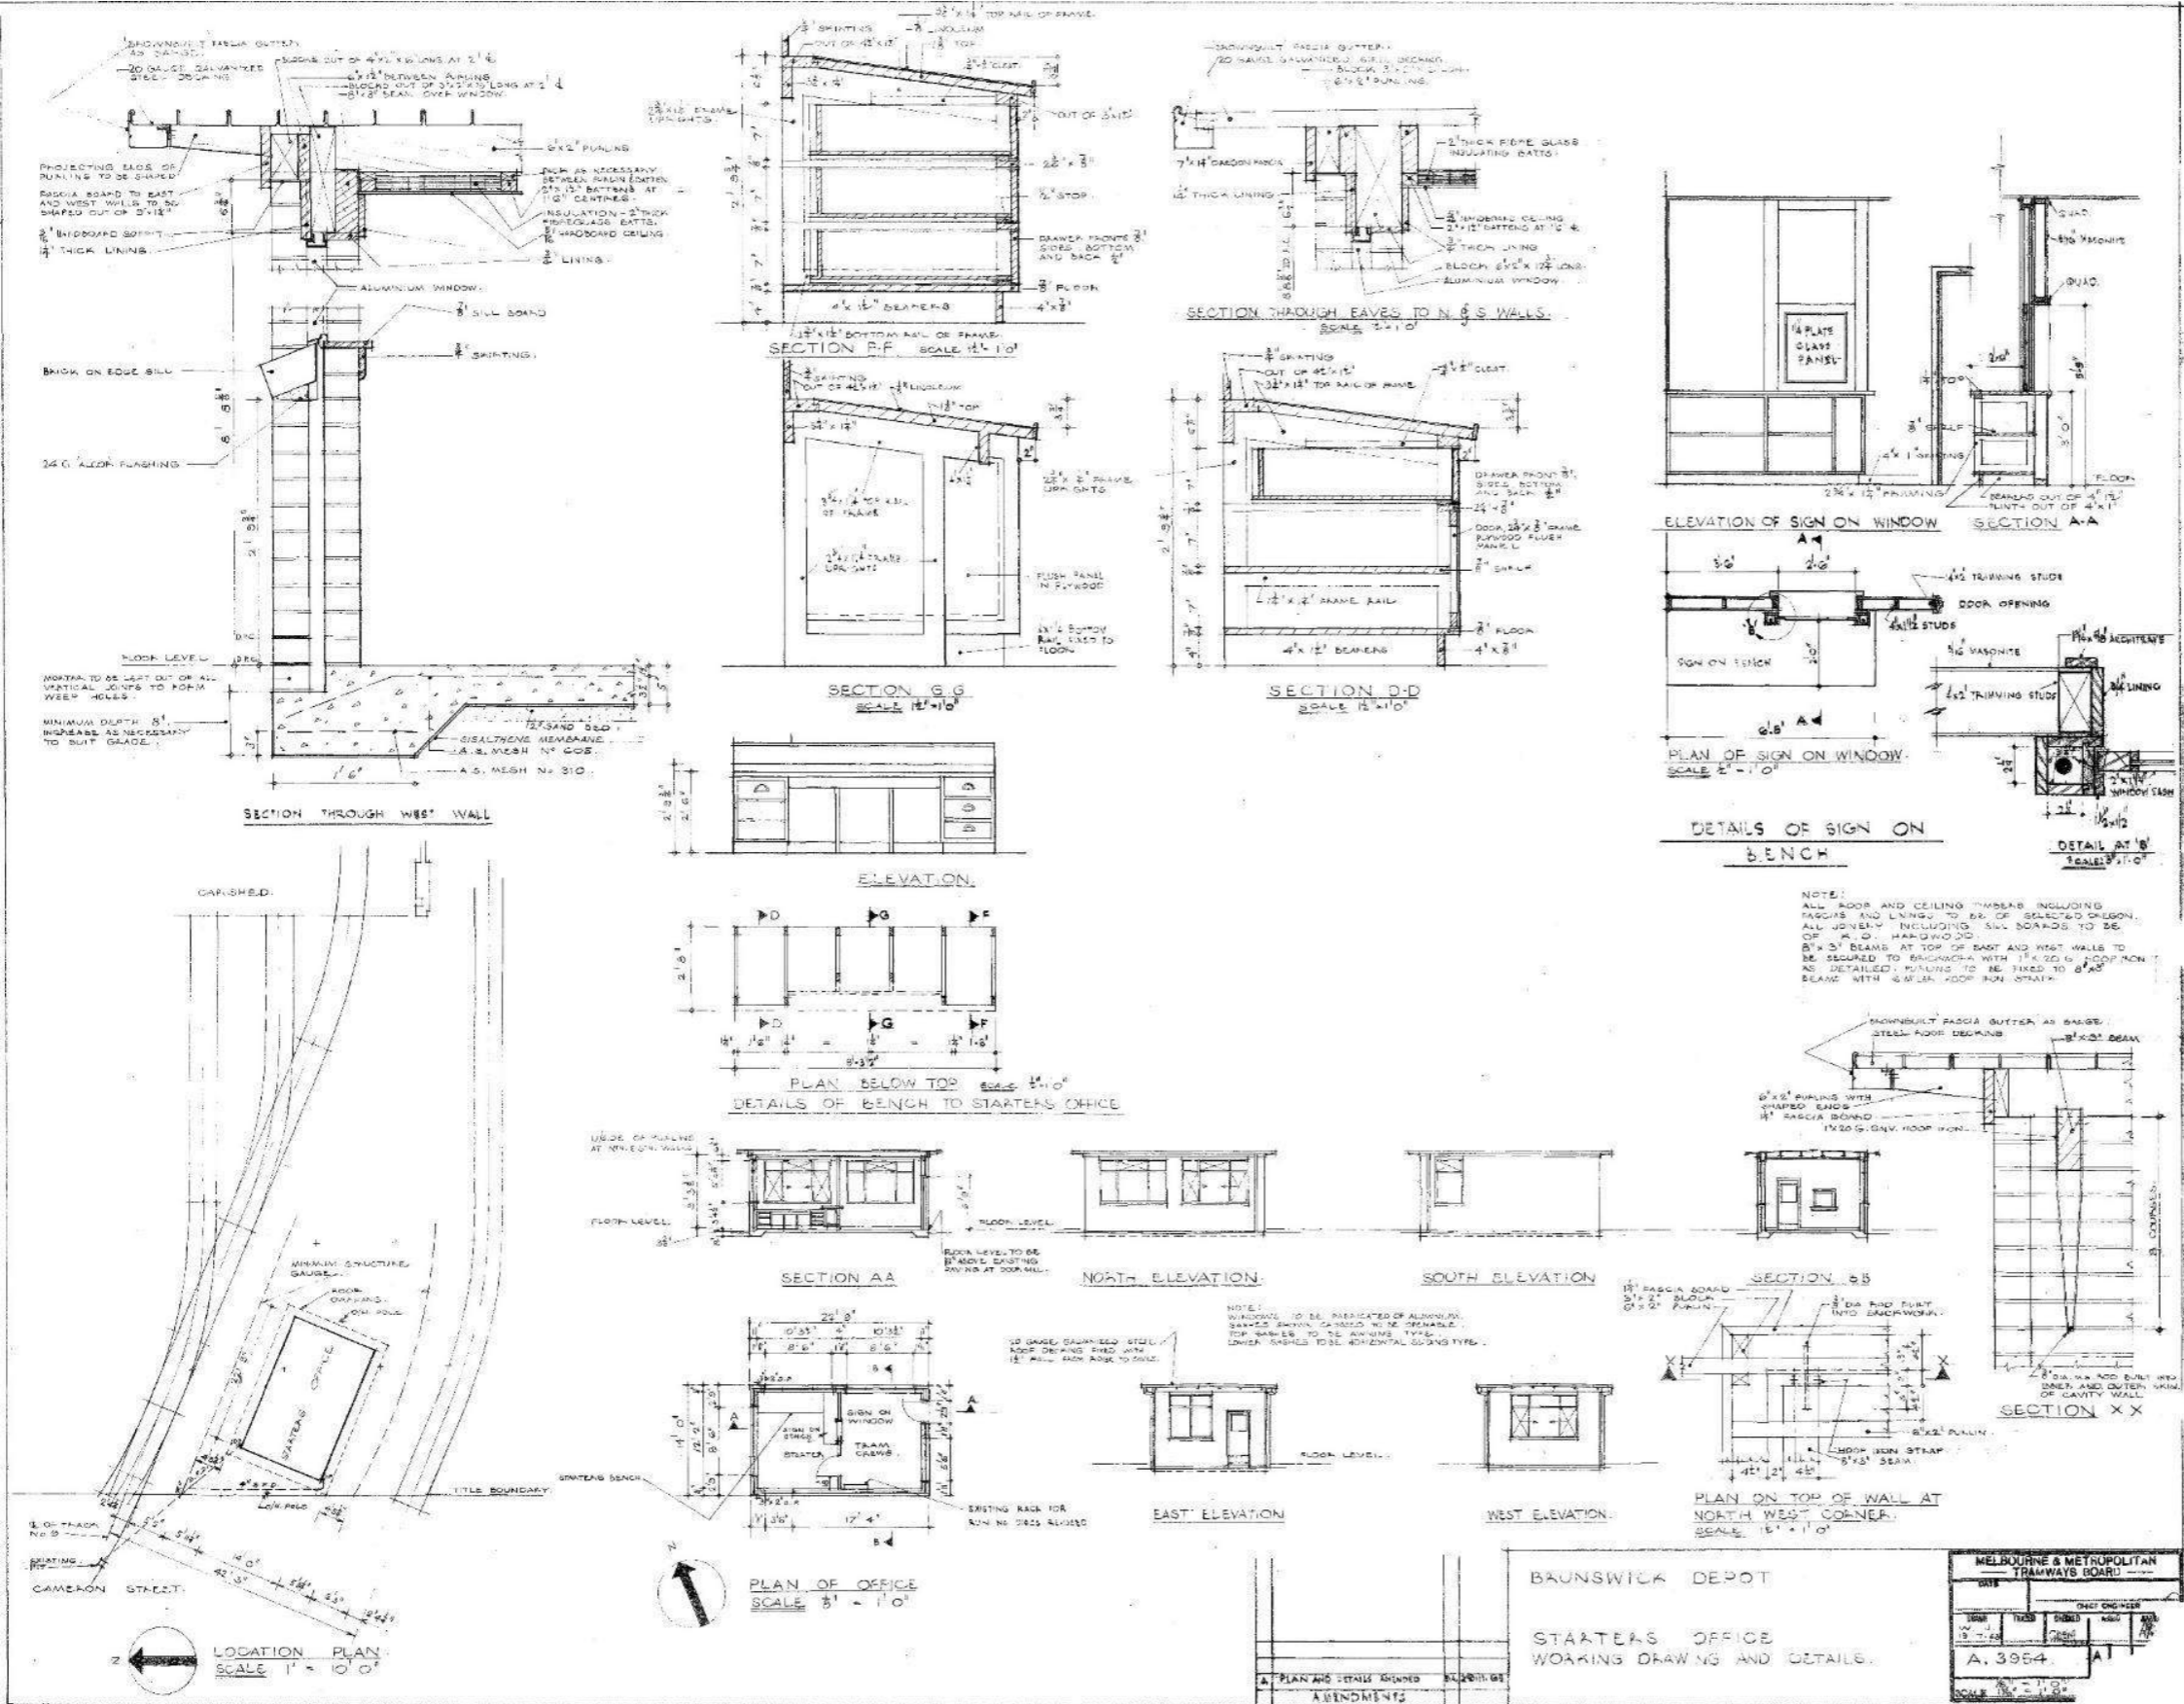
MMTB's 1935 plan of the starter's office, showing the floorplan, along with the north, south and east and exterior elevations, two interior sections, and location near Cameron Street
